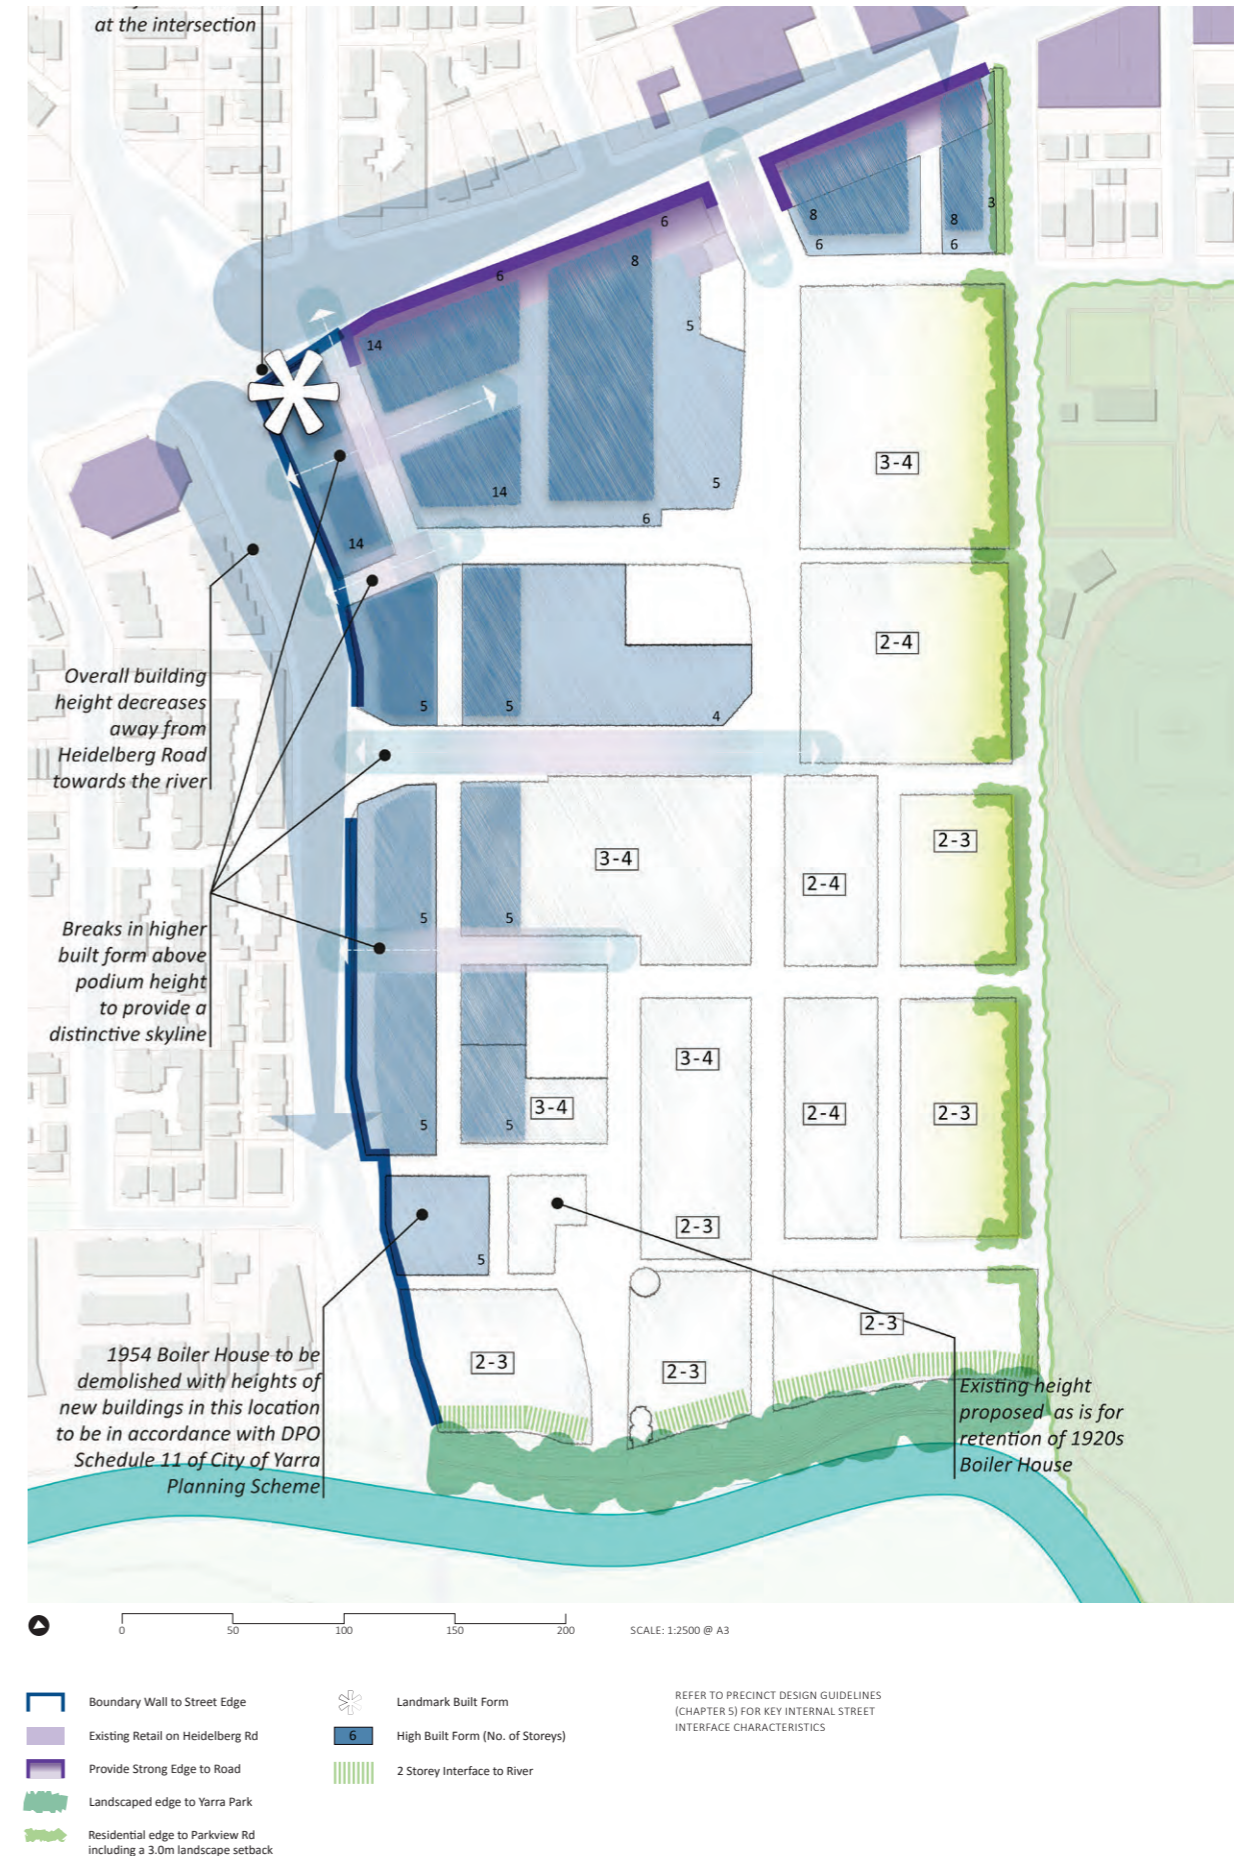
Development Plan (2016) Figure 37 - Built Form and Interface Strategy
